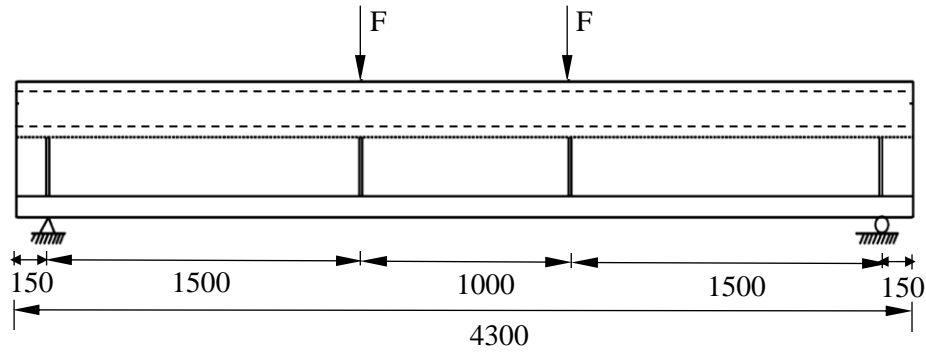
Schematic of the simply supported beam (all units in mm)
